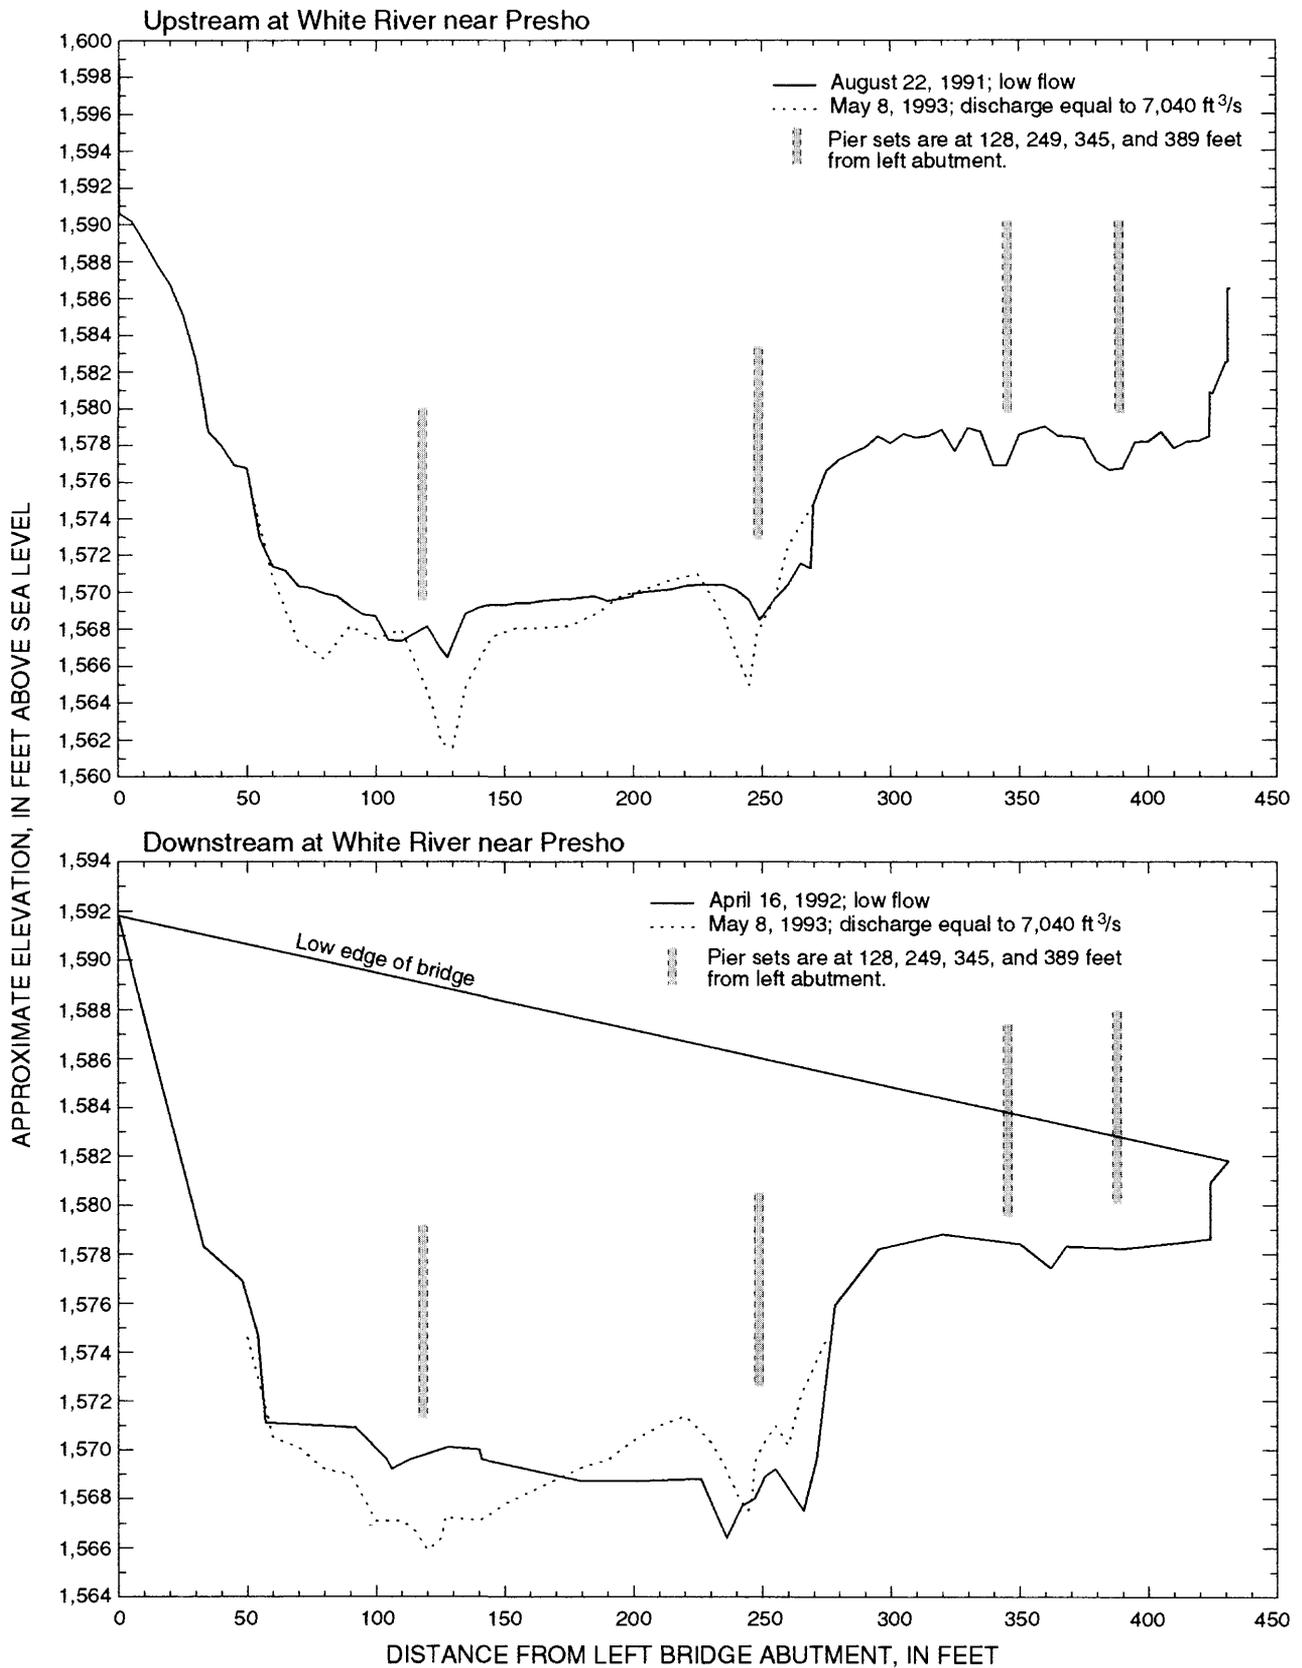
Upstream and downstream cross sections at the White River near Presho (site 28) bridge site
